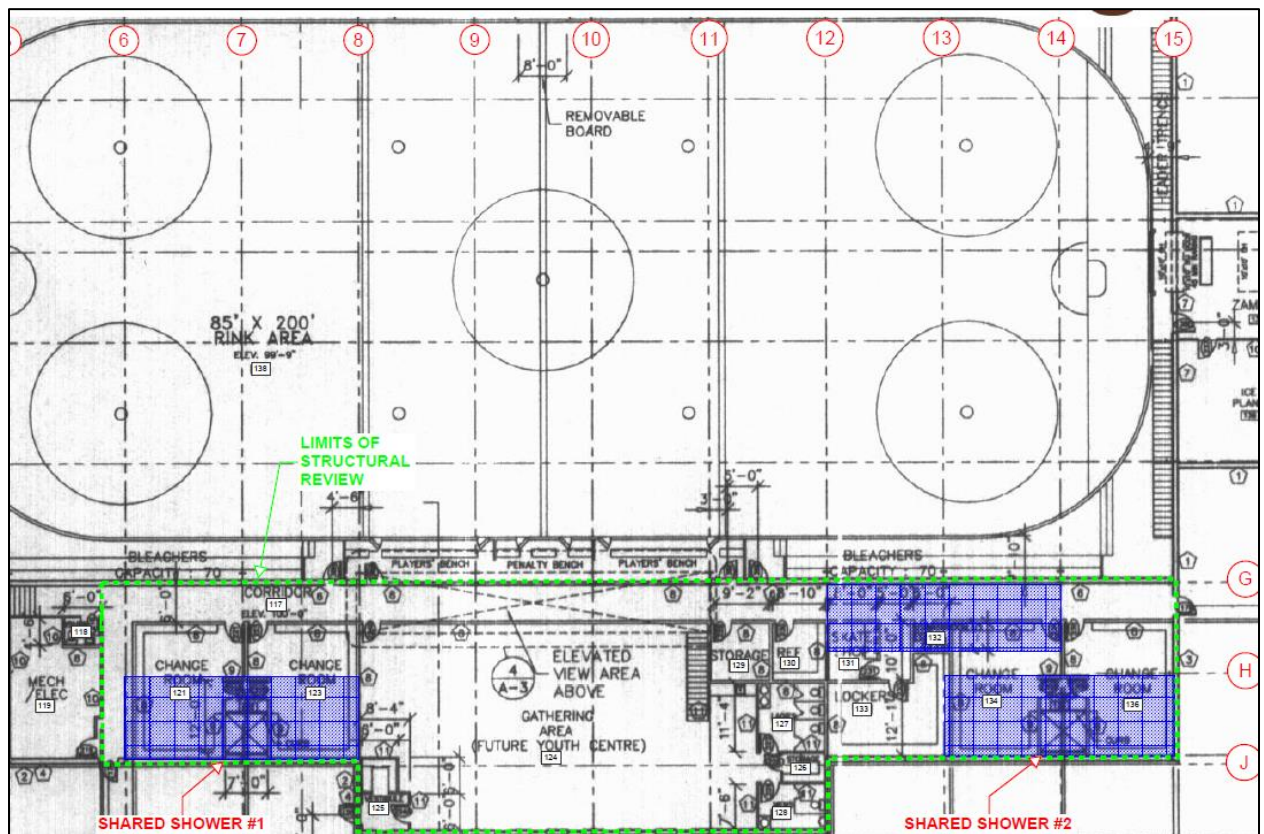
AWGA Floor Repairs – Partial Floor Plan
